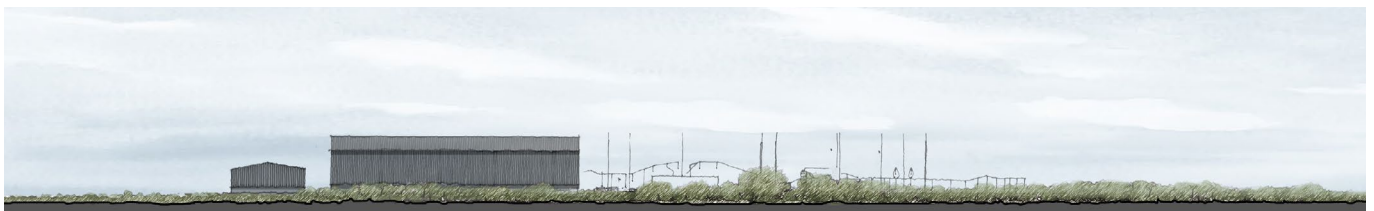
Coloured (northeast) side elevation showing Option 1 and landscape proposals
